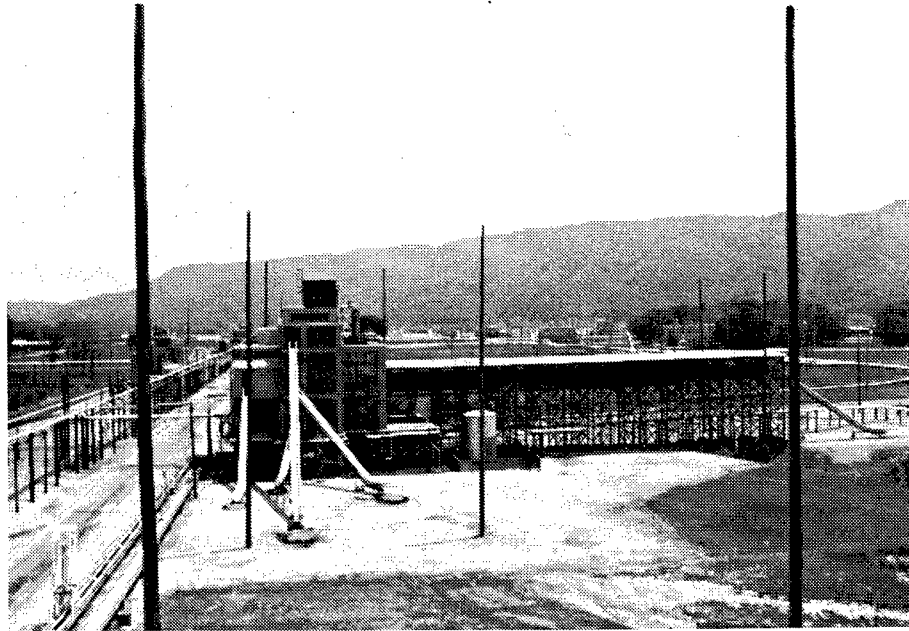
Building D2: Explosives Manufacturing Plant, Nitration Building and attached wooden Reactor Leg.
